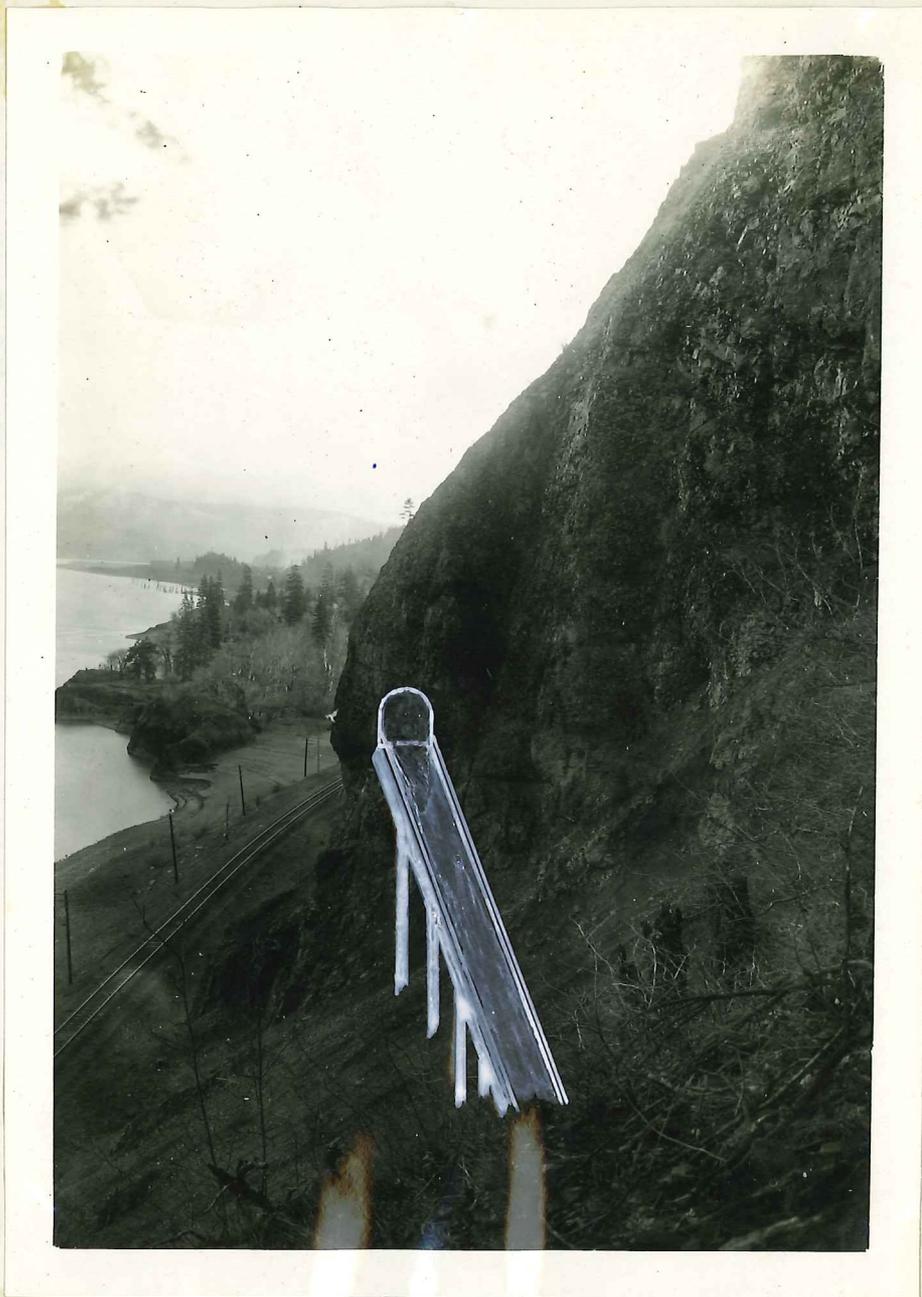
Showing Viaduct and Entrance to Tunnel No.3.
